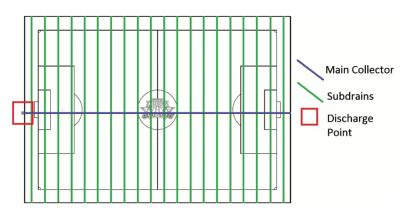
Plan view of a typical ST drainage system with a network of collection pipes ("agdrain" system) from Hudepohl (2014)
